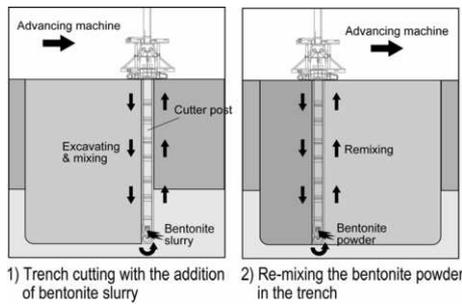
In situ construction of SB vertical cut-off wall by TRD method
